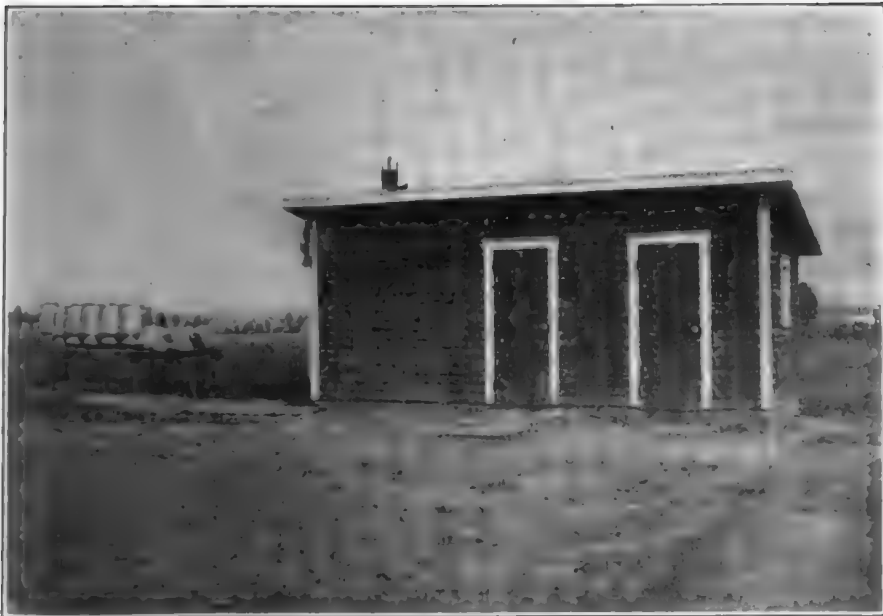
Outside view of a good type of milk house. The ground plan for this house is shown in Figure 166.
